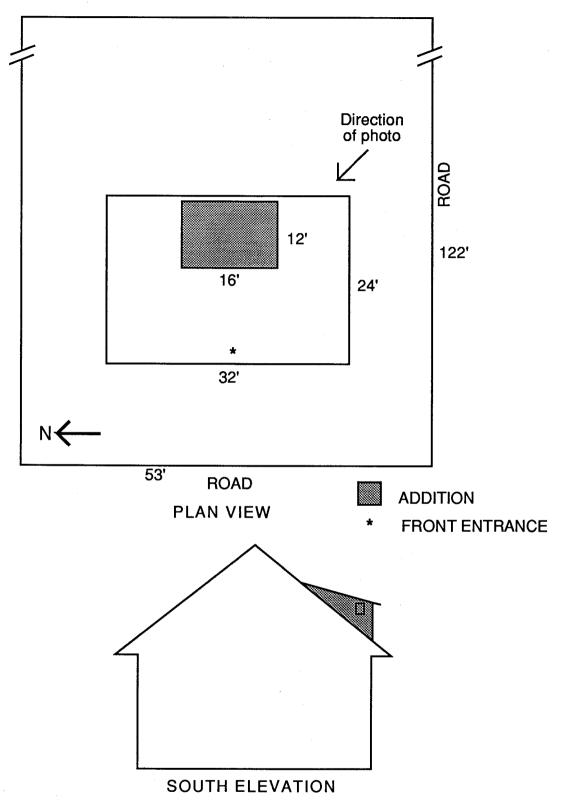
PLAN VIEW AND SOUTH ELEVATION OF HOUSE IN CASE STUDY #3
